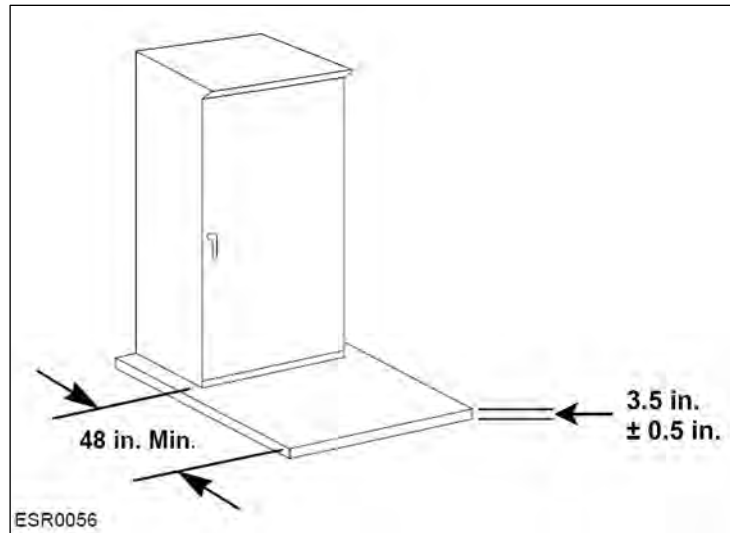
Concrete Pad in Front of Cabinet (Outdoor Metering)
